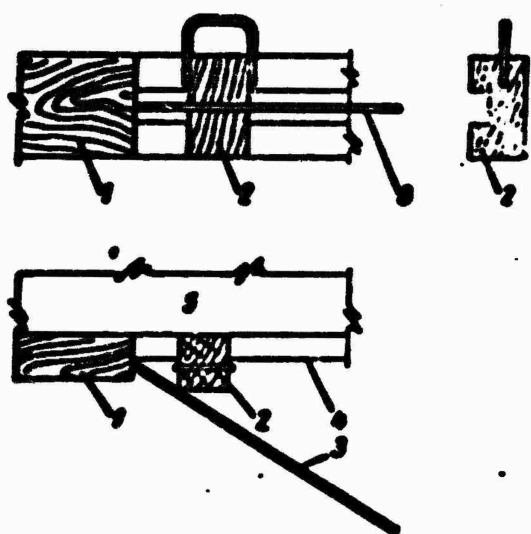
Removing the timber molds by a special shoe and crowbar. 1) Timber molds; 2) special shoe; 3) crowbar; 4) tongue of the tongue and groove shape; 5) concrete pavement.
